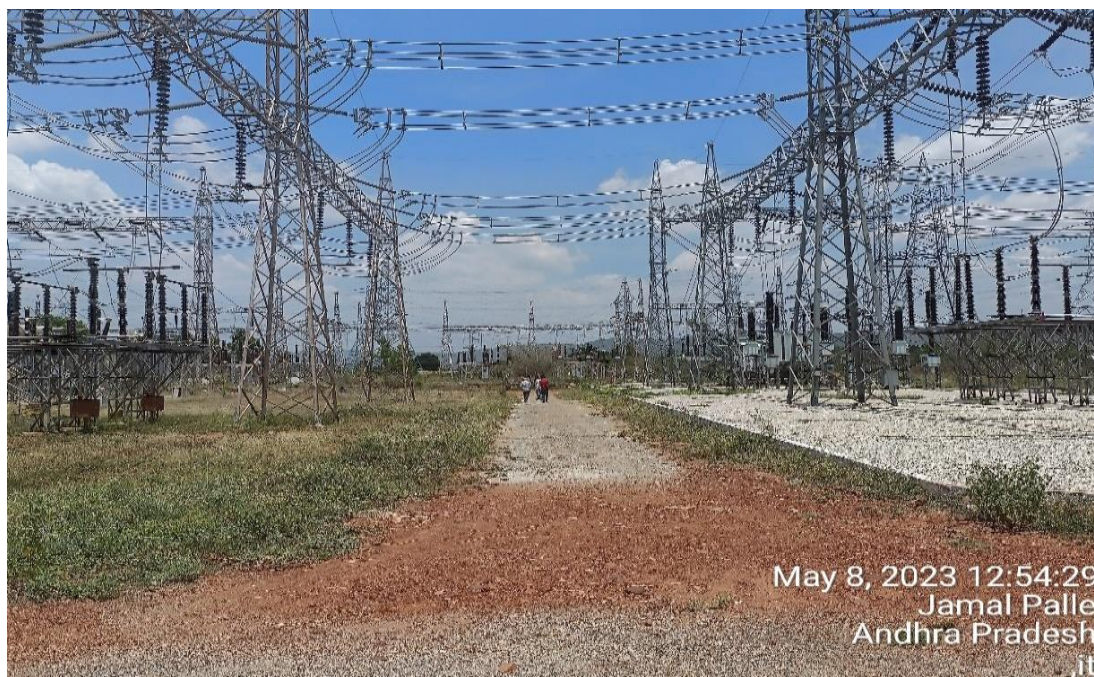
EXISTING LINES GOING THROUGH CORRIDOR OUTSIDE CHINNAKAMPALLE SUBSTATION
